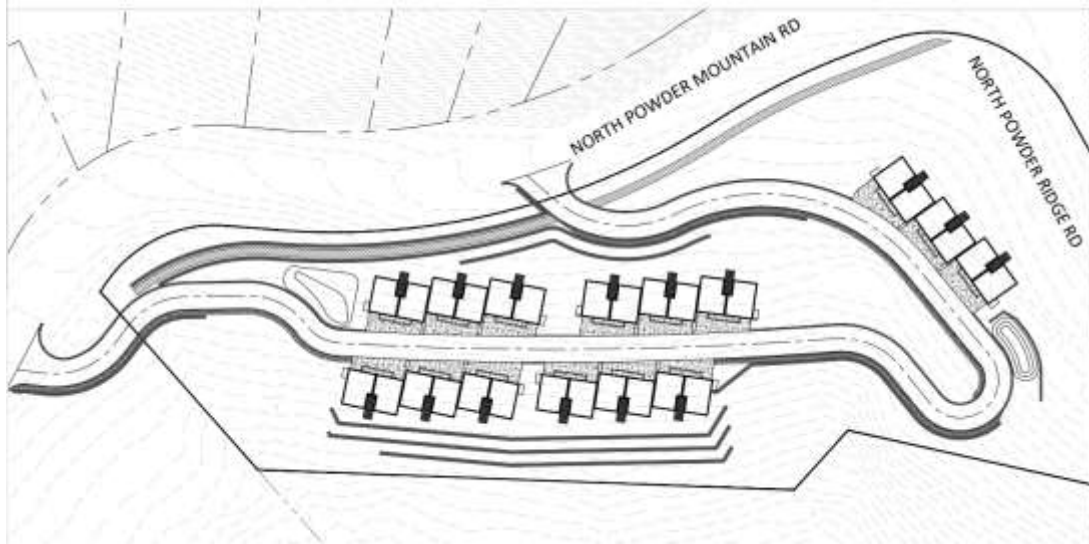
Exhibit D- Proposed Plat, and Changes from Original Site Plan
